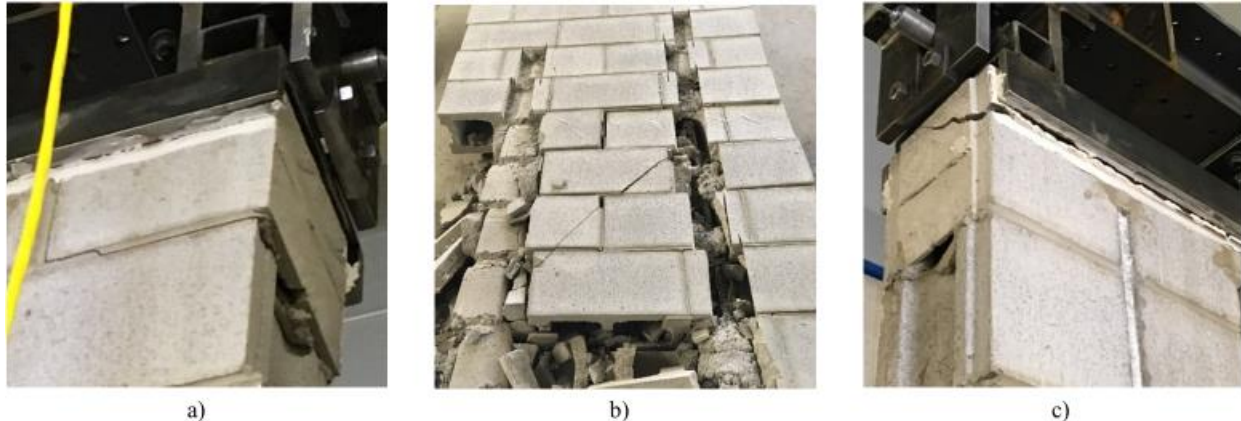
Anomalies during testing: a) crack in top course of Wall CH3200; b) incomplete grouting of reinforced cells in Wall CH3200; and c) crack in top course of Wall NH3200
